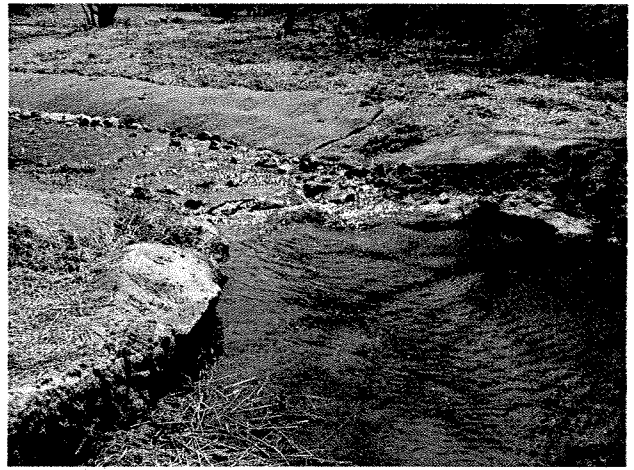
Looking upstream at log vane and root wad installed between LT Stations 2+65 and 2+90. (4/7/04)
